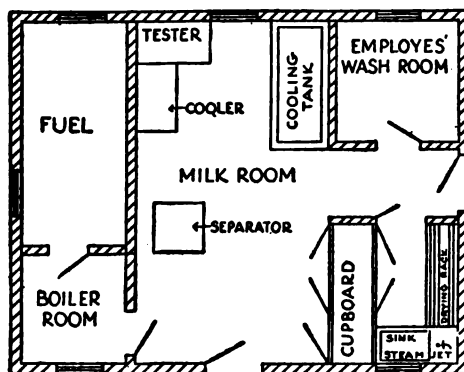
Floor plan of a small milk house adapted to the needs of a general farm carrying on a moderate dairy business.
